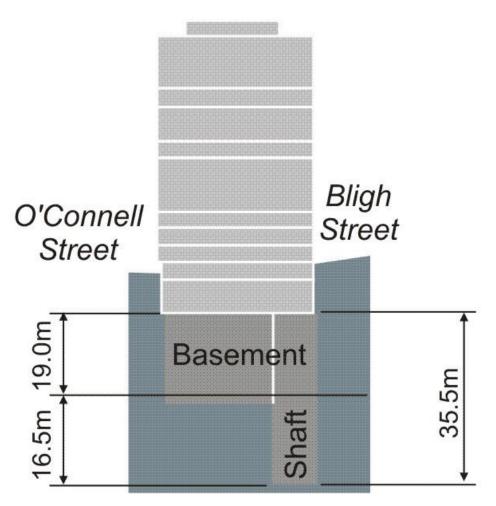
Indicative cross section of the excavation looking from Bligh Street
